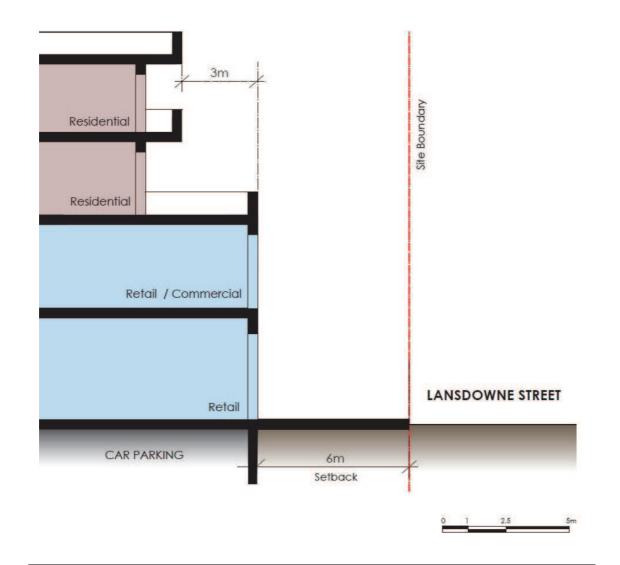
Lansdowne Street Setback - Section A-A
